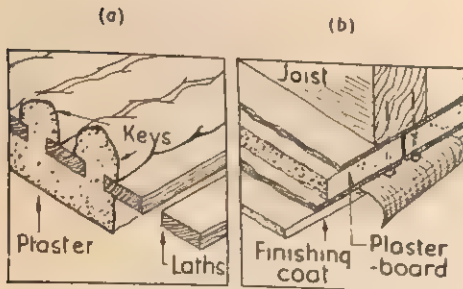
(a) How a plaster ceiling is held in place. (b) A plasterboard ceiling.
